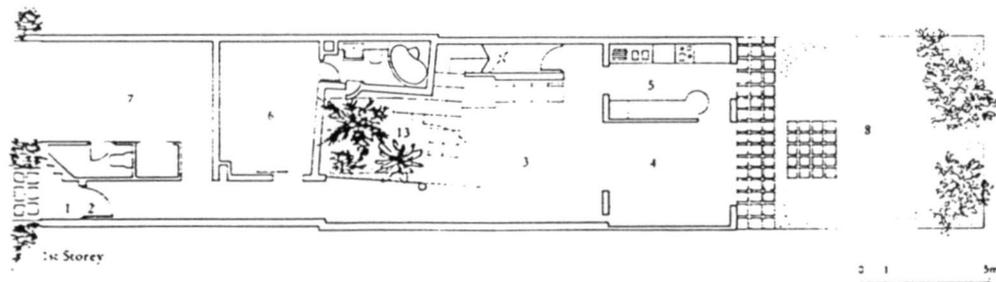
Ground floor plan of Archt. Madura Premathilaka's house
